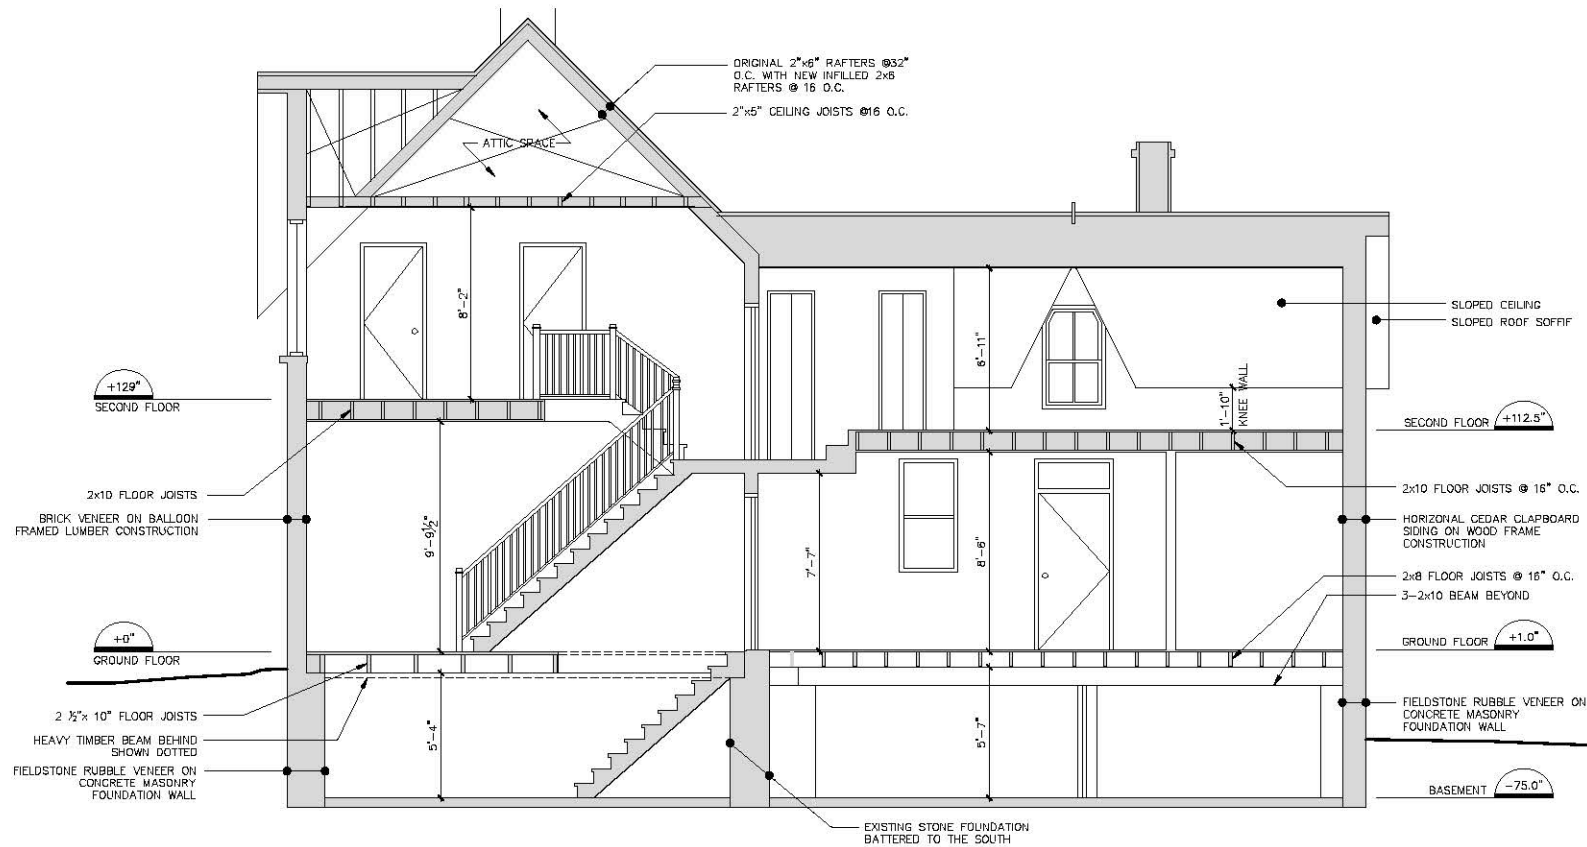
Britannia Farmhouse, Long Section, 2009.
